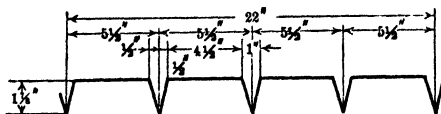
Blawsteel Long-Span Roof-Sheathing
